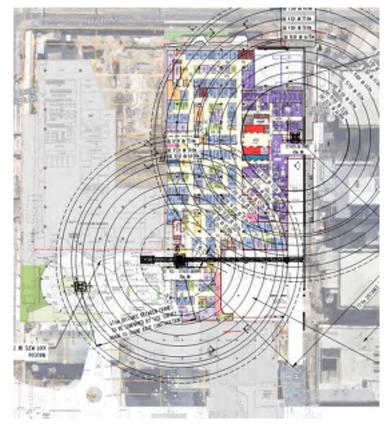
Extract from Appendix A.4 showing planned Tower Crane Locations (John Holland)
